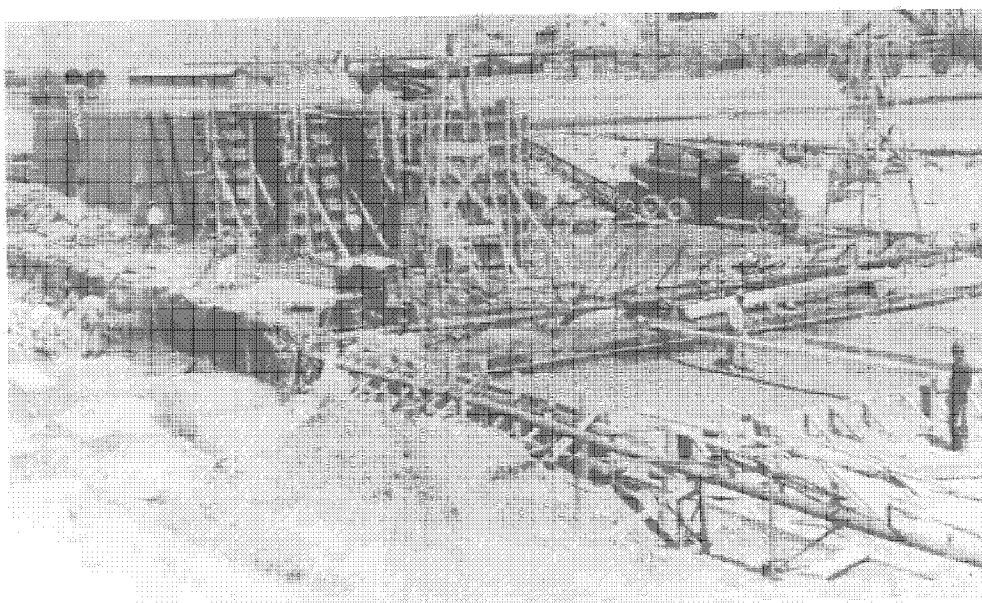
Pouring Concrete in Pier 5, American Dam, 19 April 1937.
